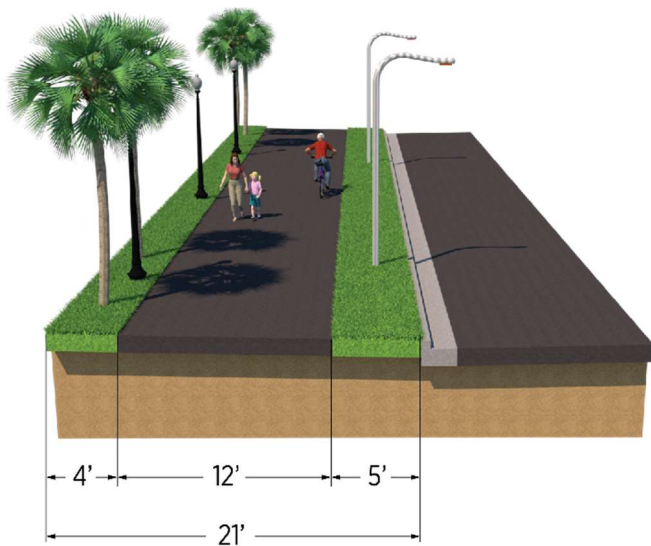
Typical Section for Sidewalk on Arterial (Curbed)
